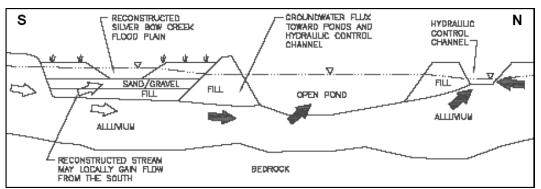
Cross section of the reconstructed Silver Bow Creek channel in relation to the open ponds and hydraulic control channel showing relative water surface elevations to be maintained (modified from PRP Group 2002).
